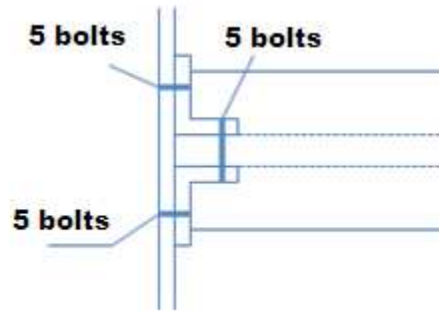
Double Angle Connection Bolts per Angle Leg and Location
